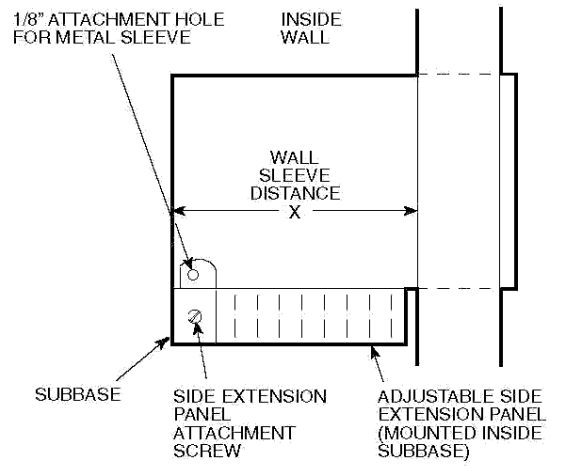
Attaching Adjustable Side Extensions to Subbase
